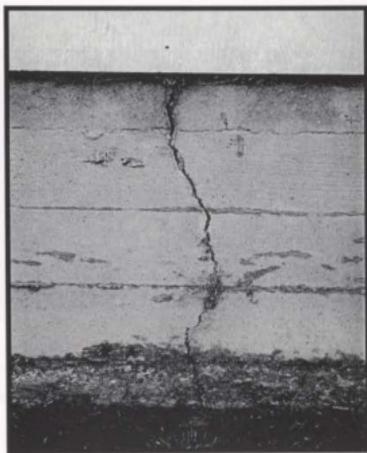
Crack in the board-formed concrete foundations on the eastern end of the northern elevation.
